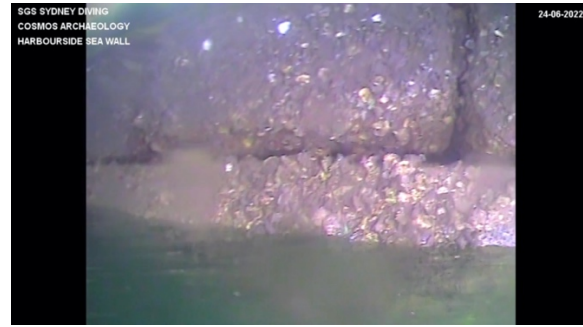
Underneath public walkway, the stones have experienced mortar loss above water. (Image 220624_Stone seawall dilapidation_S_walkway, 00.44)
